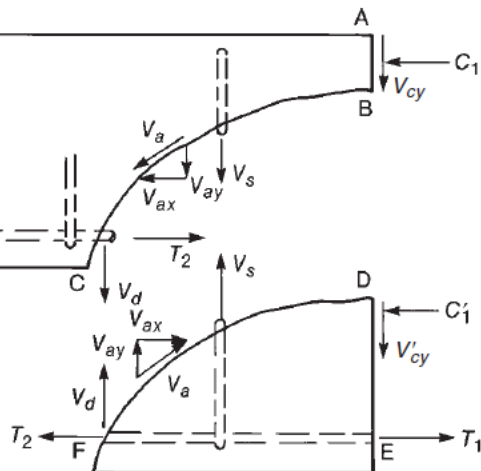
Internal forces in a cracked beam with stirrups[13]
